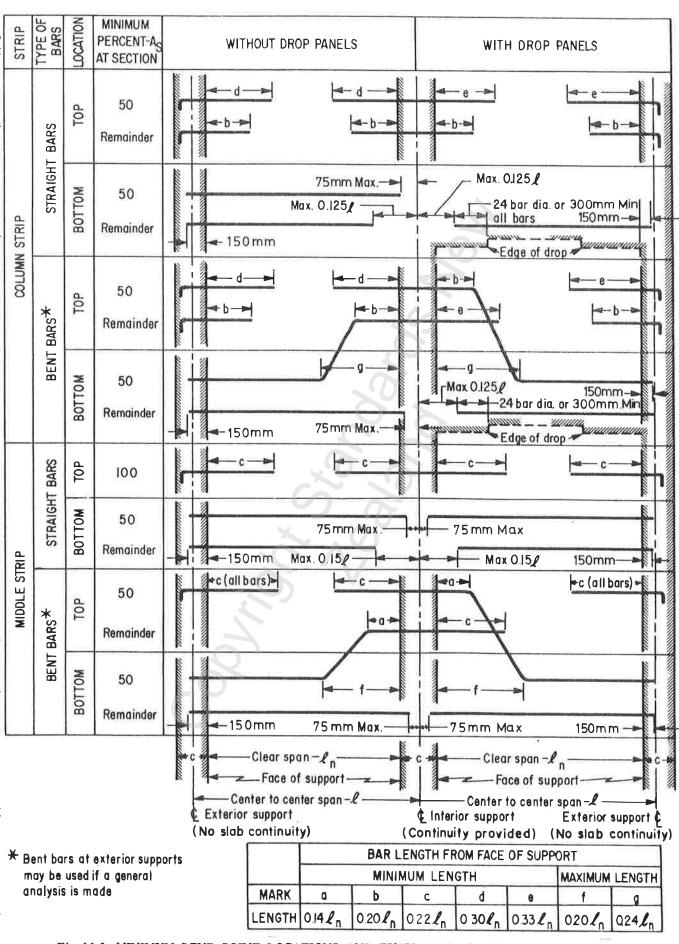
MINIMUM BEND POINT LOCATIONS AND EXTENSIONS FOR REINFORCEMENT IN SLABS WITHOUT BEAMS (see 5.3.25.1 for reinforcement extension into supports)
